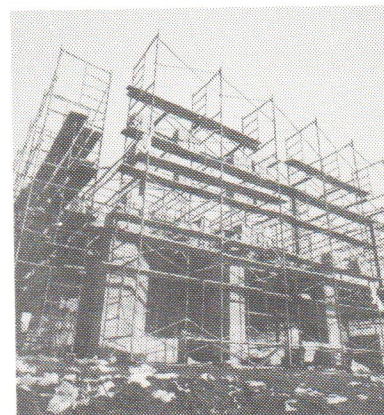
The scaffolding outlines the new building while providing masons with a platform upon which to work.
